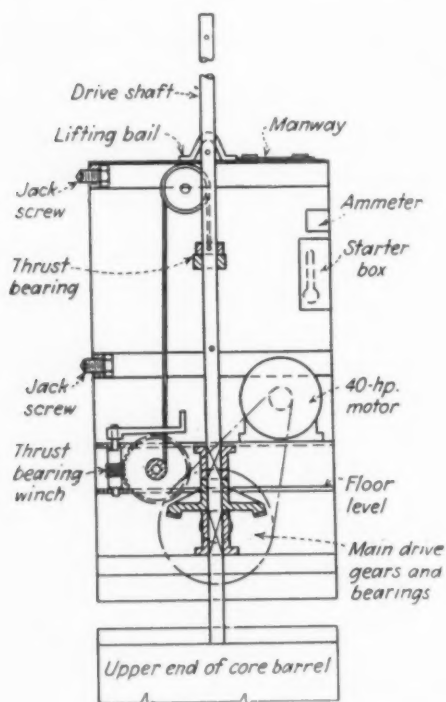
GENERALIZED CROSS SECTION OF THE SHAFT DRILL
